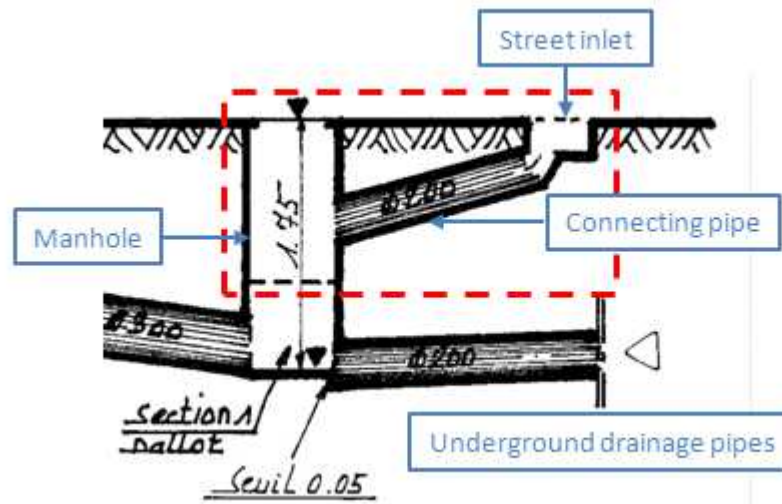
Connection of one street inlet to the underground drainage system. The exchange structure is indicated with the dashed red line.
